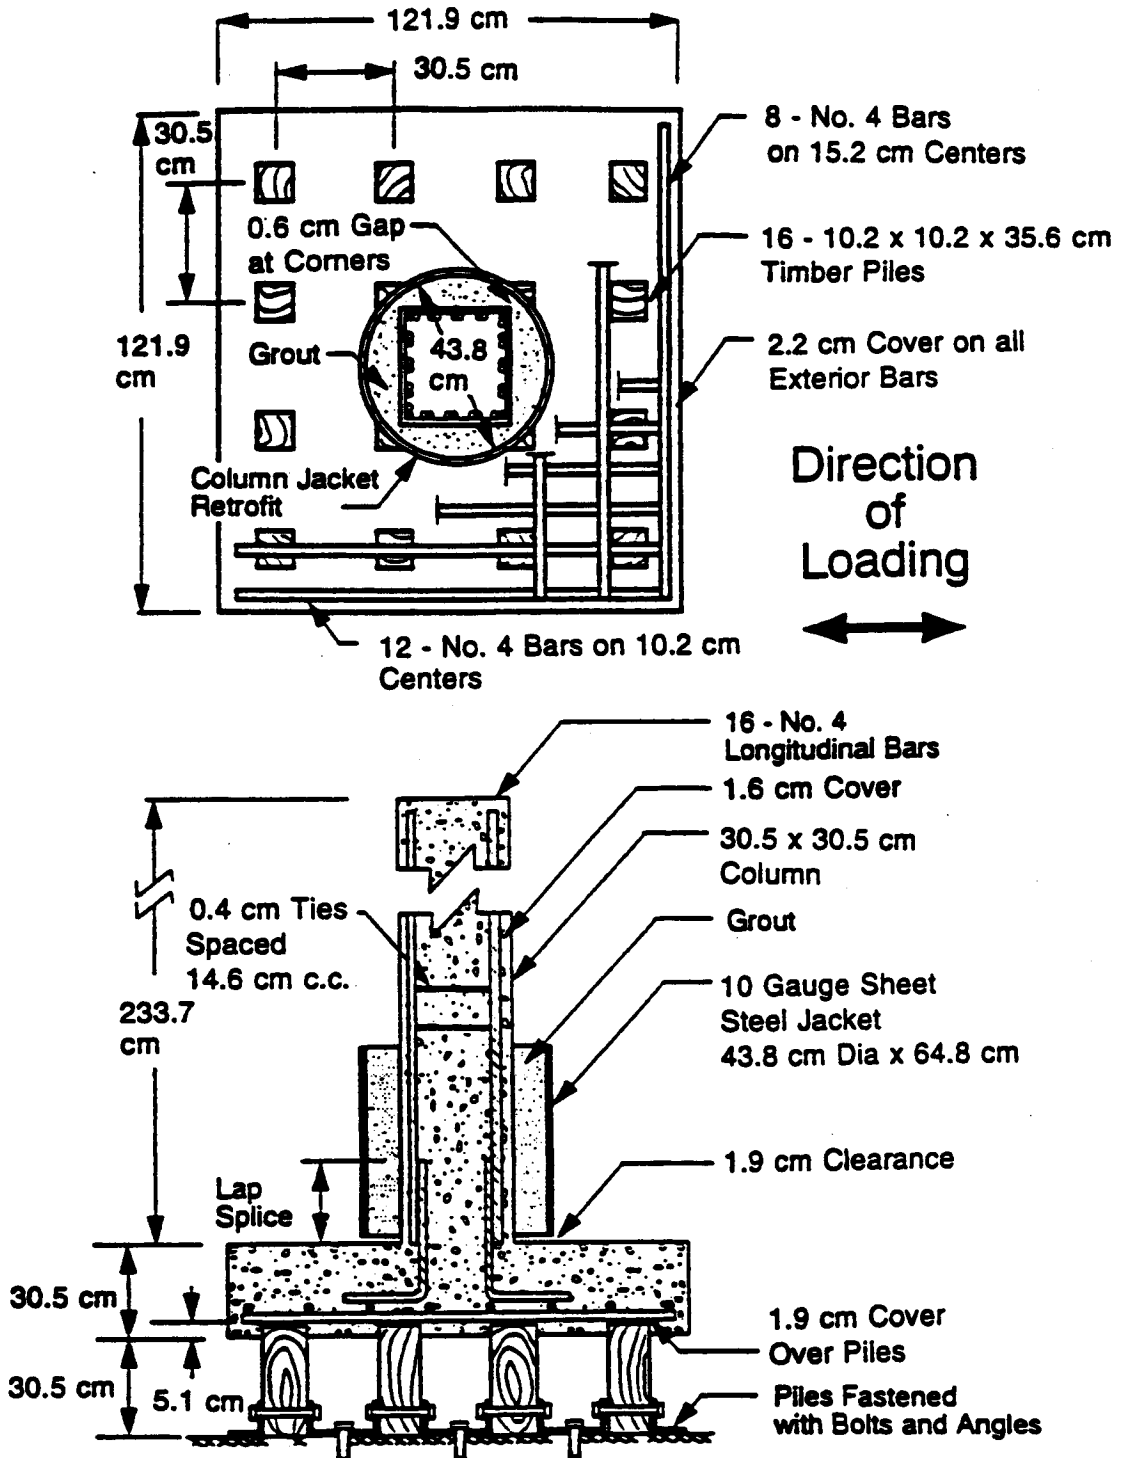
Details of Specimen No. P1 Representing the As-Built Pile-Supported Specimen
